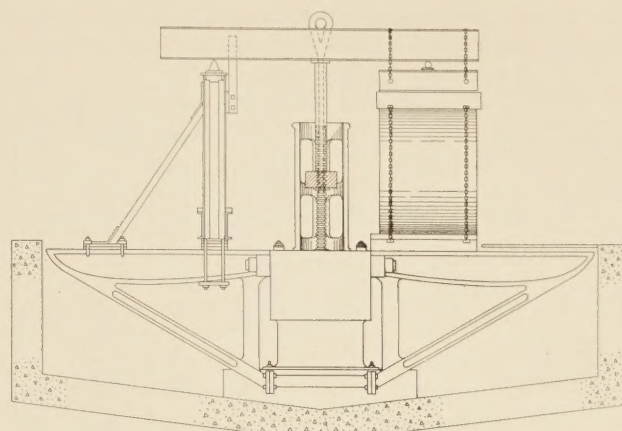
FORTY-EIGHT-INCH PIPE SET UP IN 200,000-POUND TESTING MACHINE.
